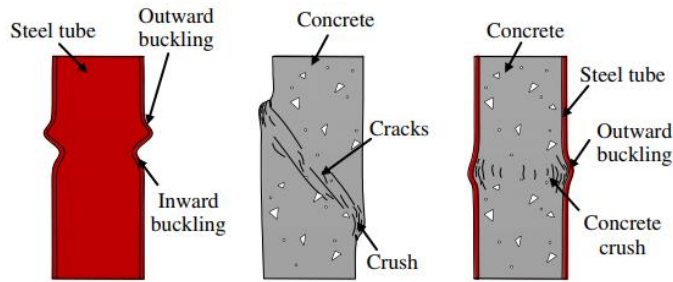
The failure mode of steel tube columns, concrete columns, and corresponding CFST columns.
